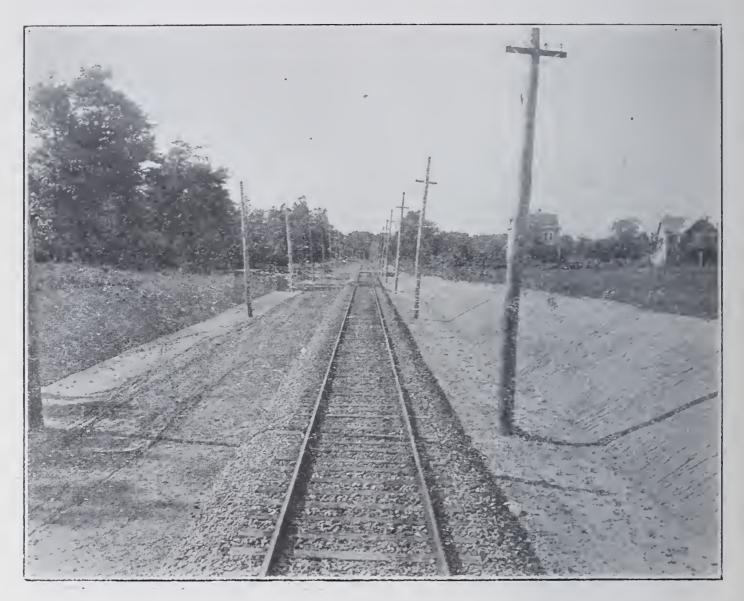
A piece of trackwork of the Philadelphia and Garrettford Street Railway, Collingdale Extension, constructed by the Company's own force.
